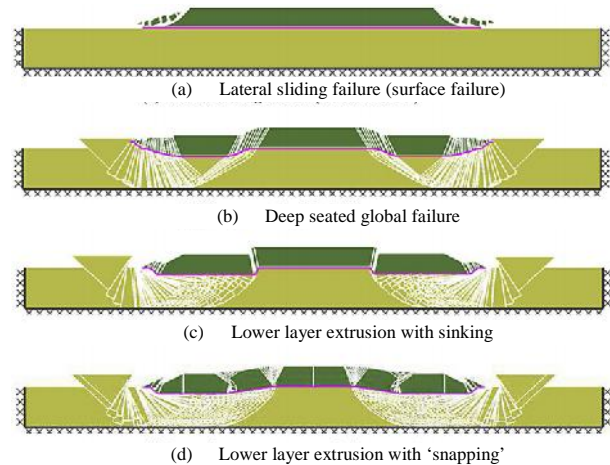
Typical Failure of Embankment (Smith et al., 2016)
